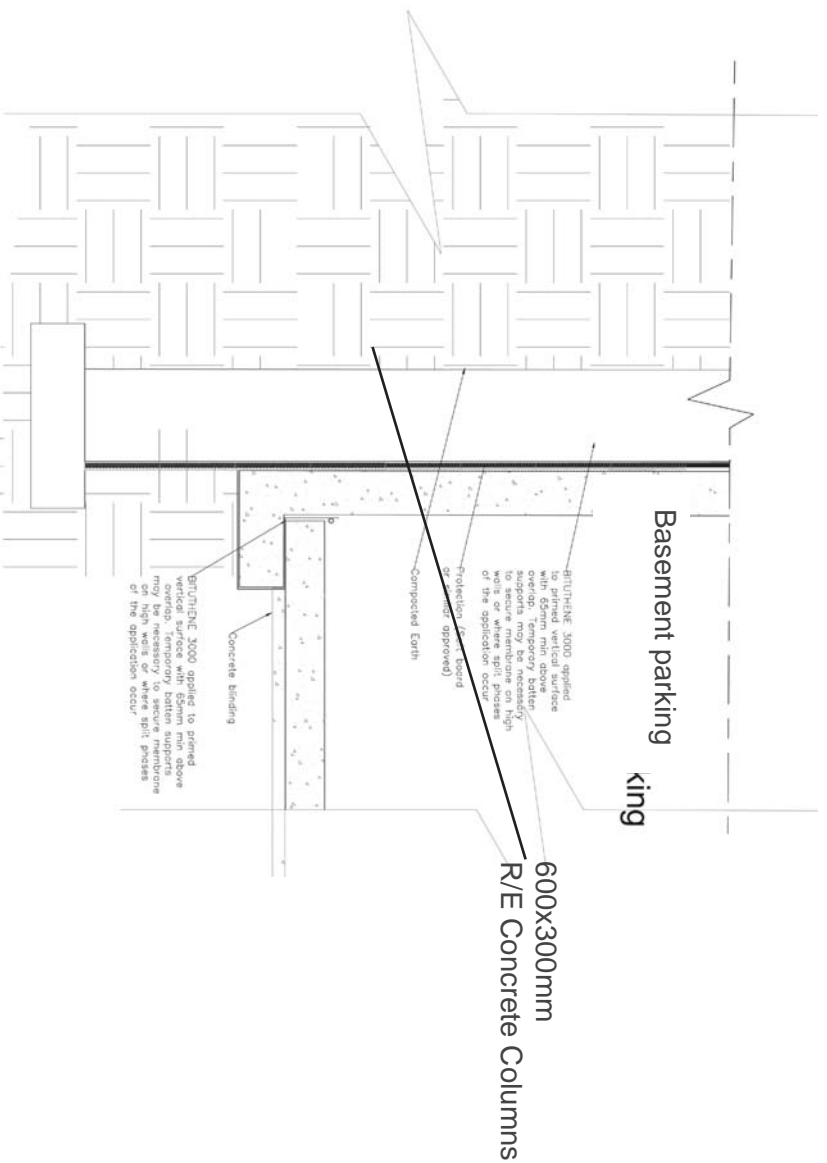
Two-part retaining wall accommodating weave associated with ground conditions
